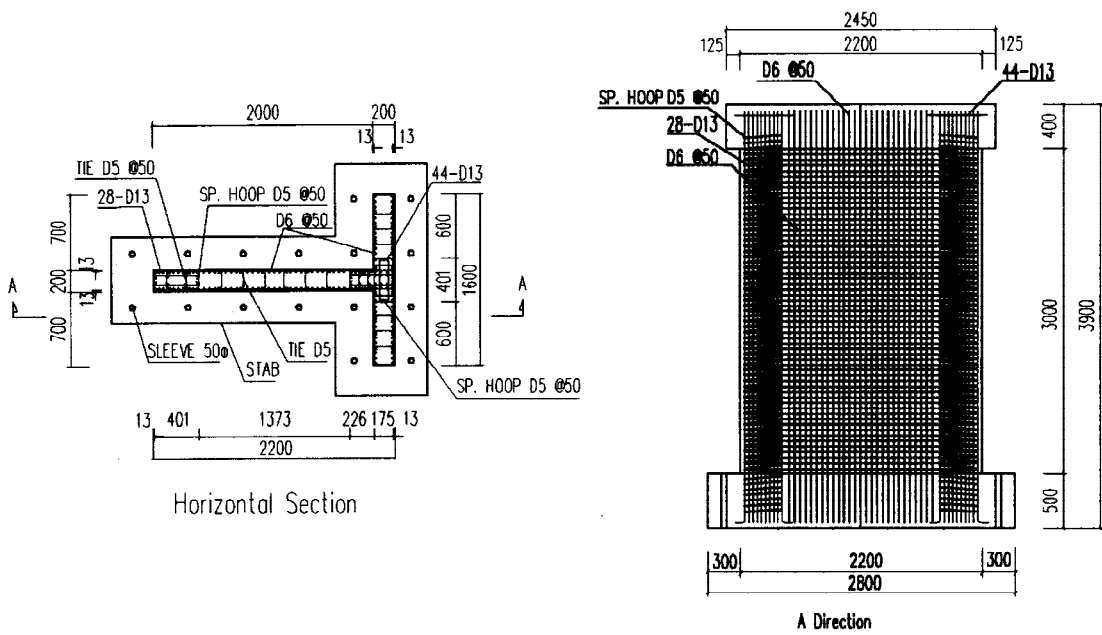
Reinforcement Details of T-Shaped Wall Specimen HW1
